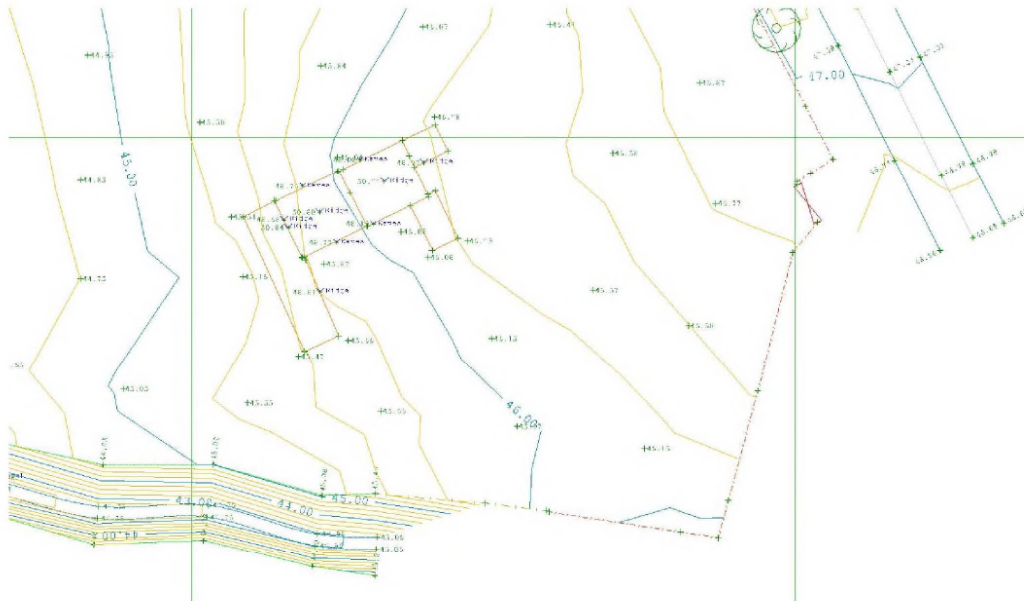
plan of the current building, as extract from topographical survey (Schmuck Whorlton drawing no. 20170404-03)
